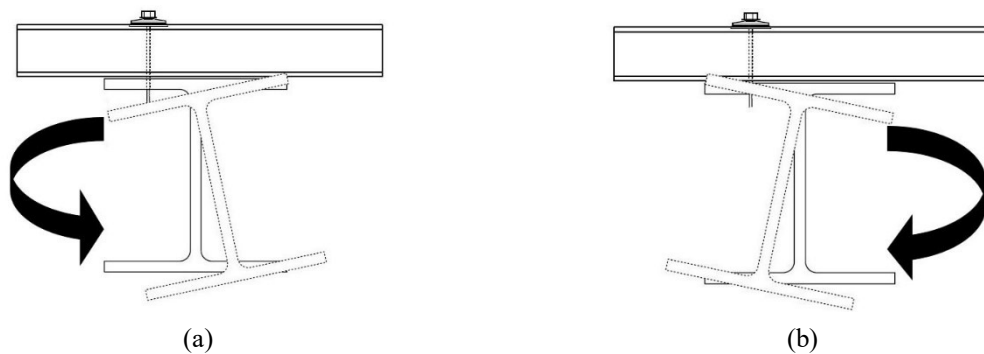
Sandwich panels under torsional loading: a) screw on the tension side, b) screw on the compression side [9]
